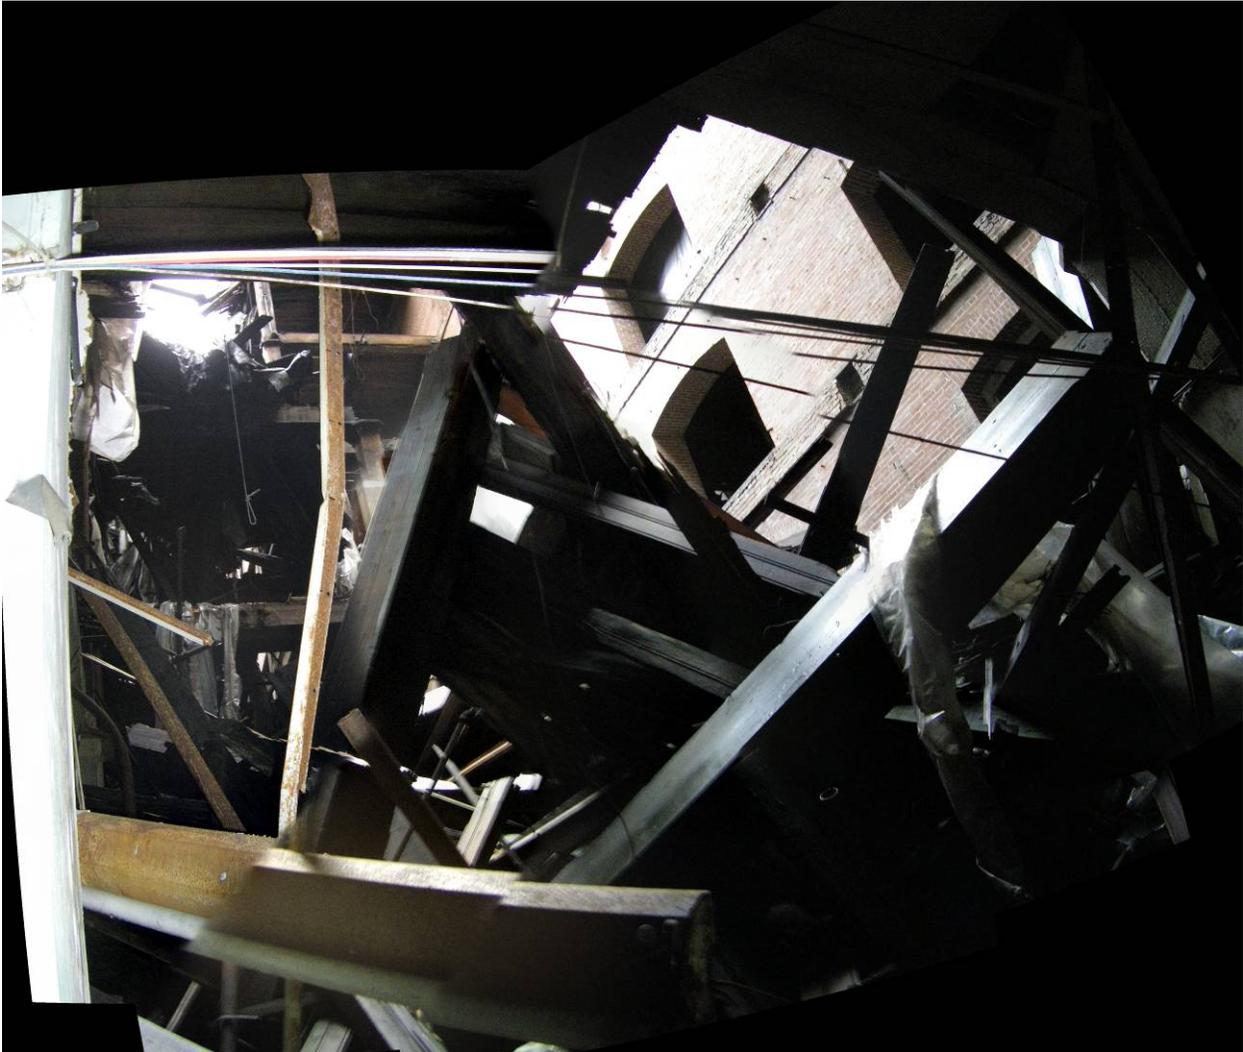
East Side Partial Collapse, Looking Southwest at Center Wall (composite image)
